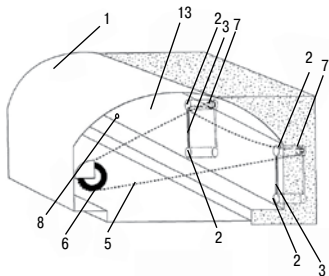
Tunnel of the design profile, four boreholes and two parallel strips cut in the perpendicular plane, and the rotation tool
